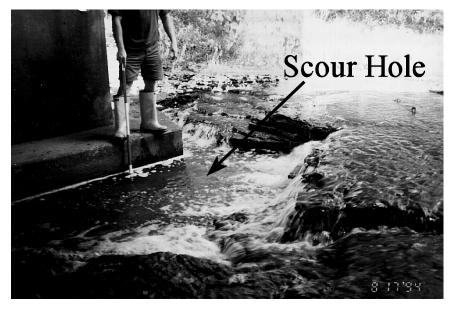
A scour hole at a bridge abutment founded on rock, KY Route 1659 bridge over Glenn's Creek in Woodford County, Kentucky.
